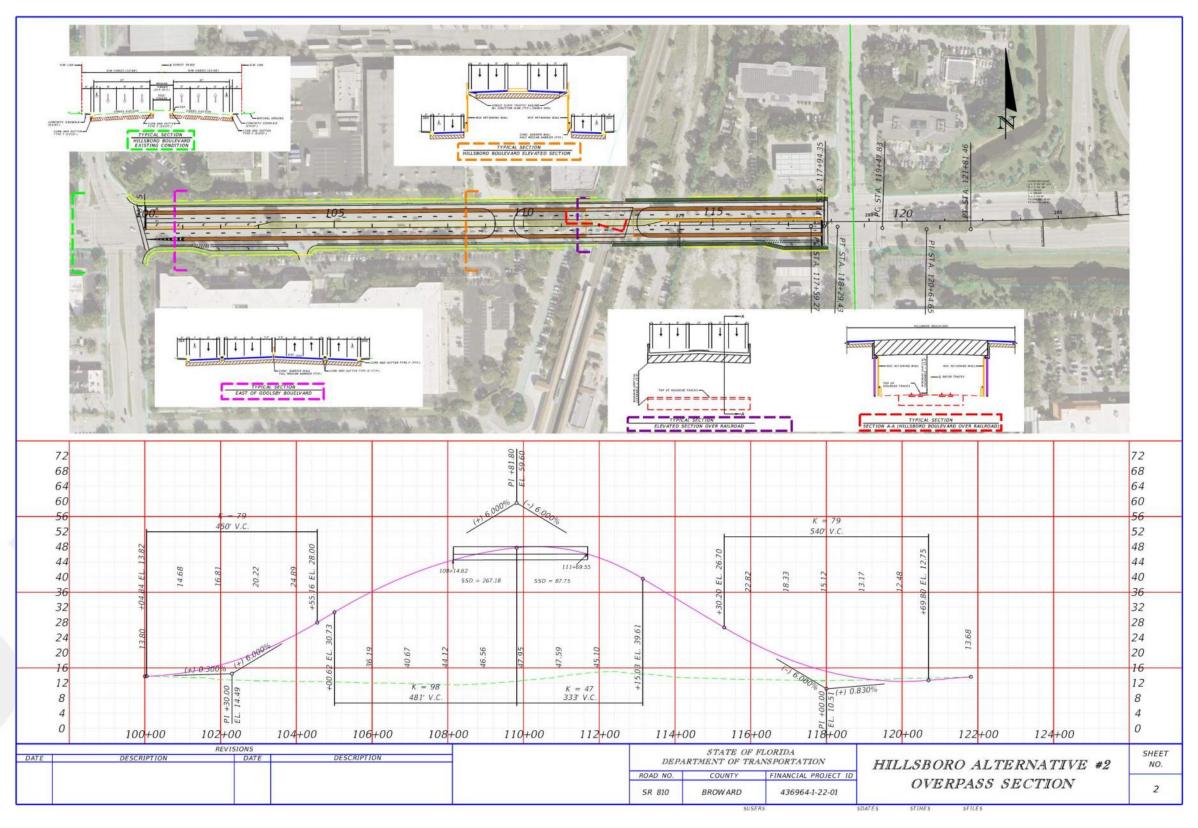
Hillsboro Boulevard – Concept Plan – Alternative 2
